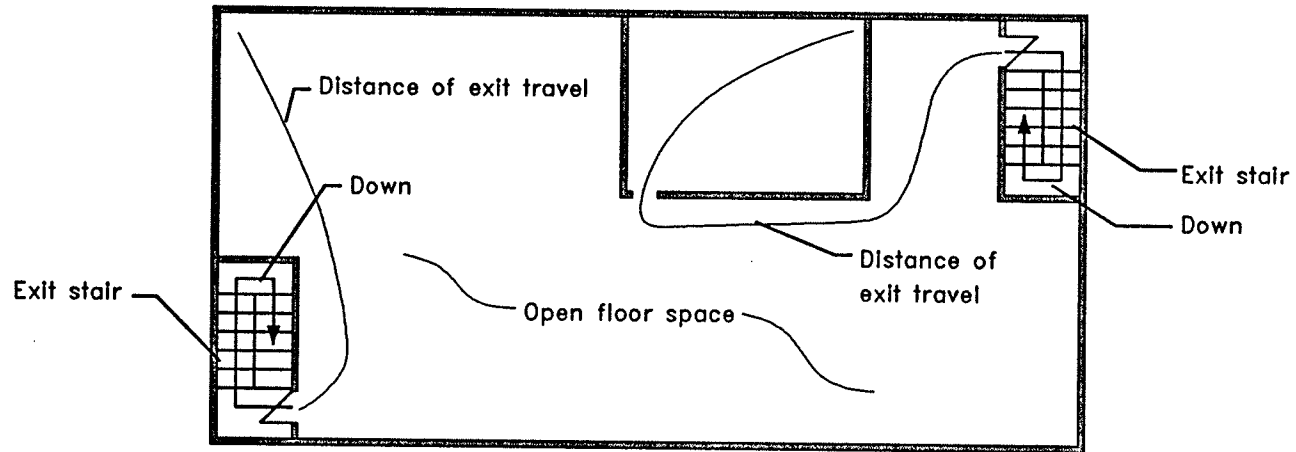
Floor-to-Floor and Exit Compartmentation
